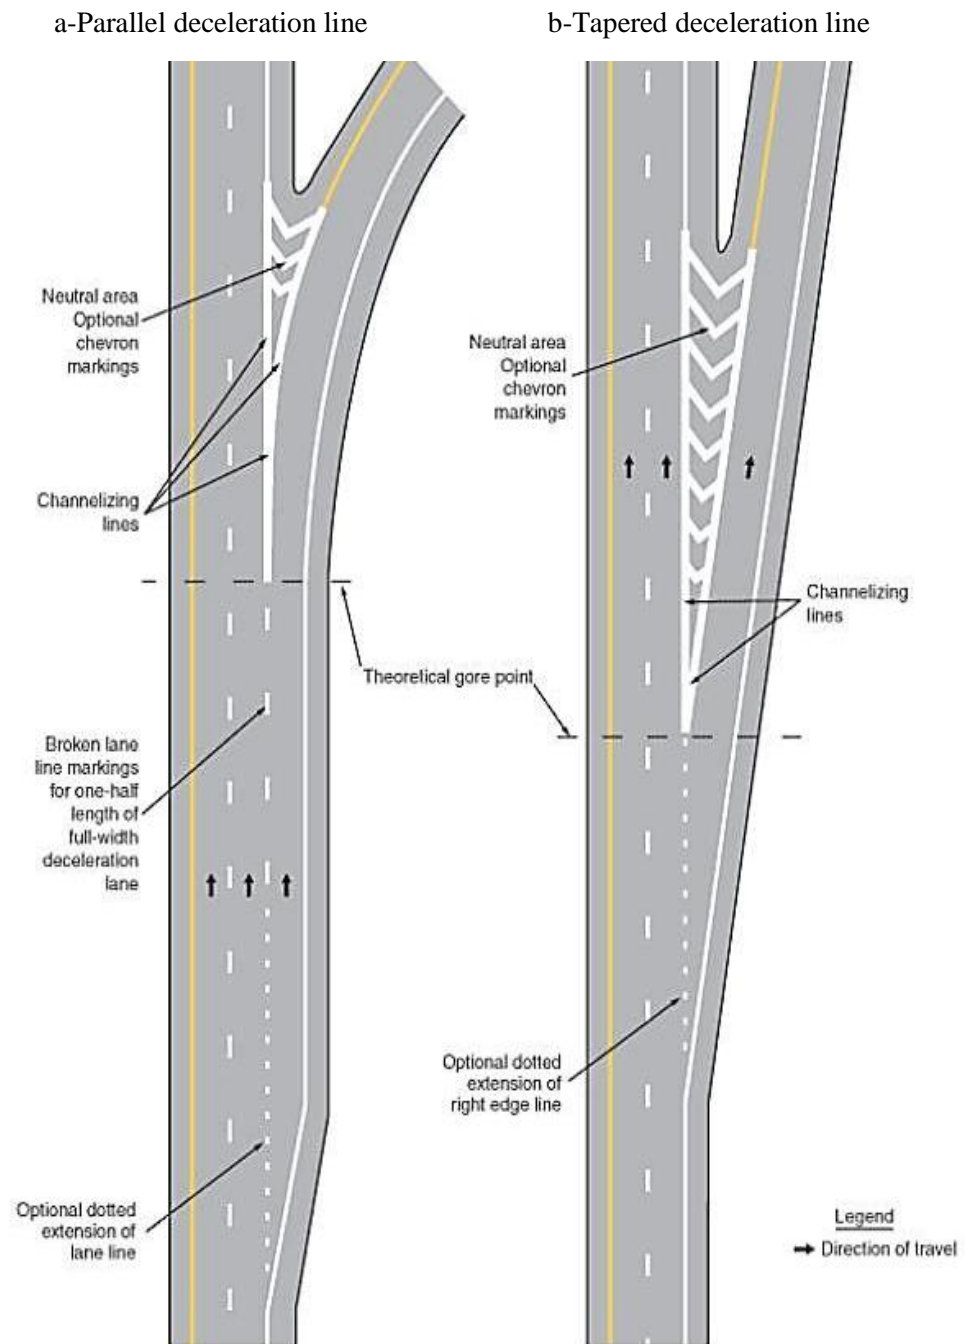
/26: Examples of Channelizing Line Applications for Exist Ramp Markings [2, p.3B-12]
